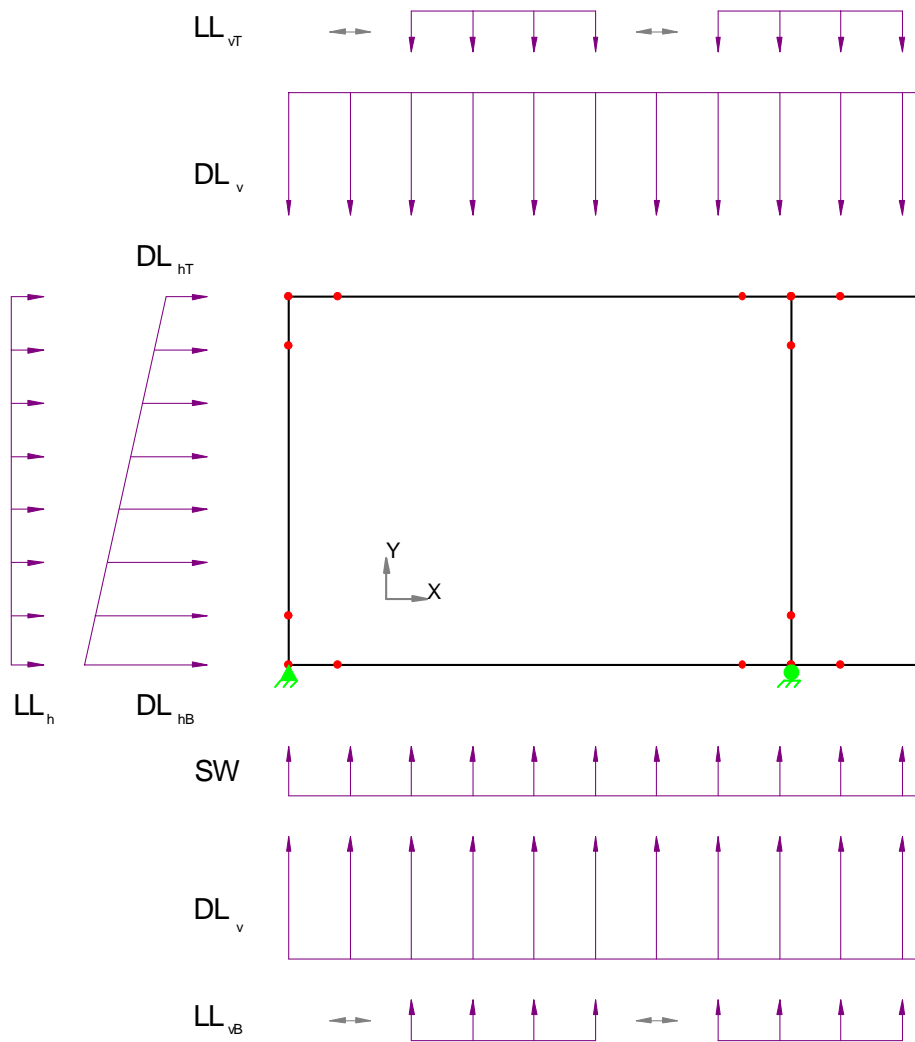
LOAD CONVENTIONS FOR TWO DIMENSIONAL, SIMPLY-SUPPORTED STRUCTURAL FRAME MODEL.
